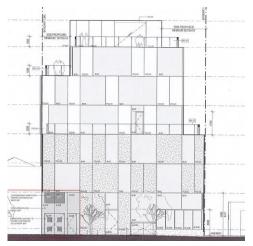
Extract of endorsed plans for PLN13/0763 showing west elevation of No. 4-6 Gold Street
